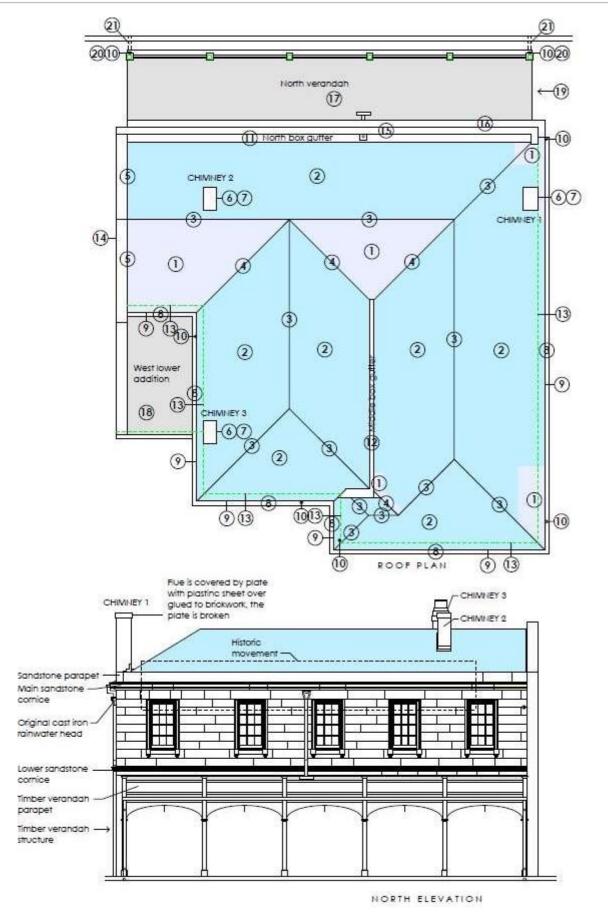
Condition Assessment Drawing (Roof Plan and North Elevation). Source: OCP Architects 2024.
